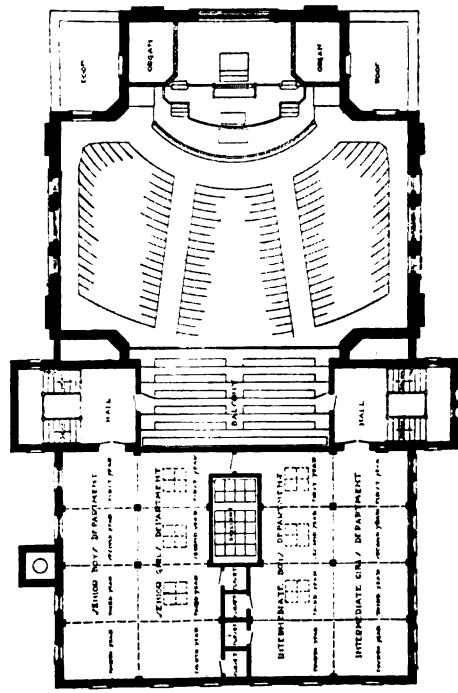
FIRST METHODIST CHURCH, CLINTON, IND.—GALLERY LEVEL PLAN.
